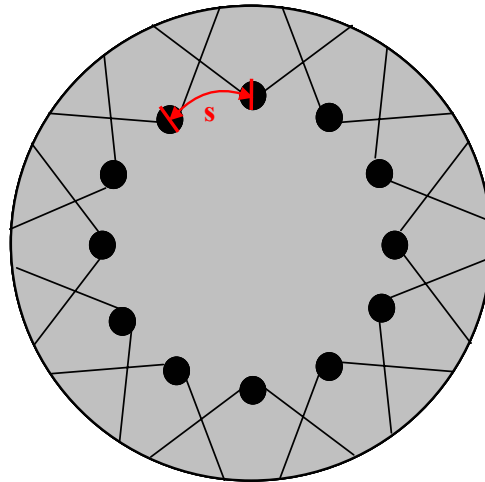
Overlap of failure cones for a circular foundation
